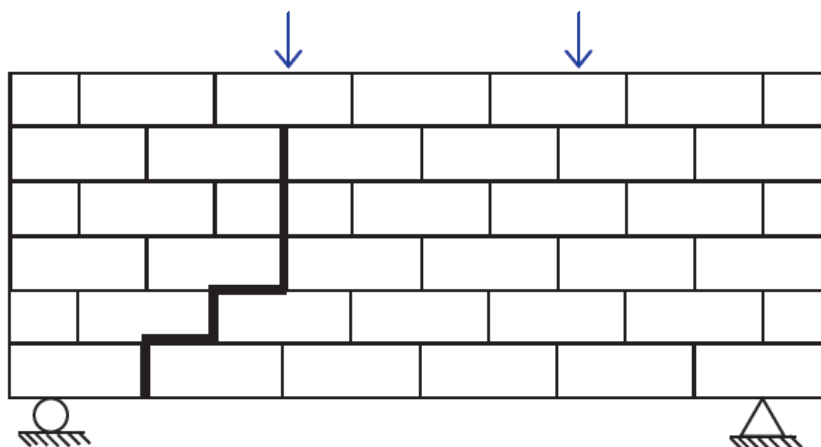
Shear bond failure caused by foundation settlement
